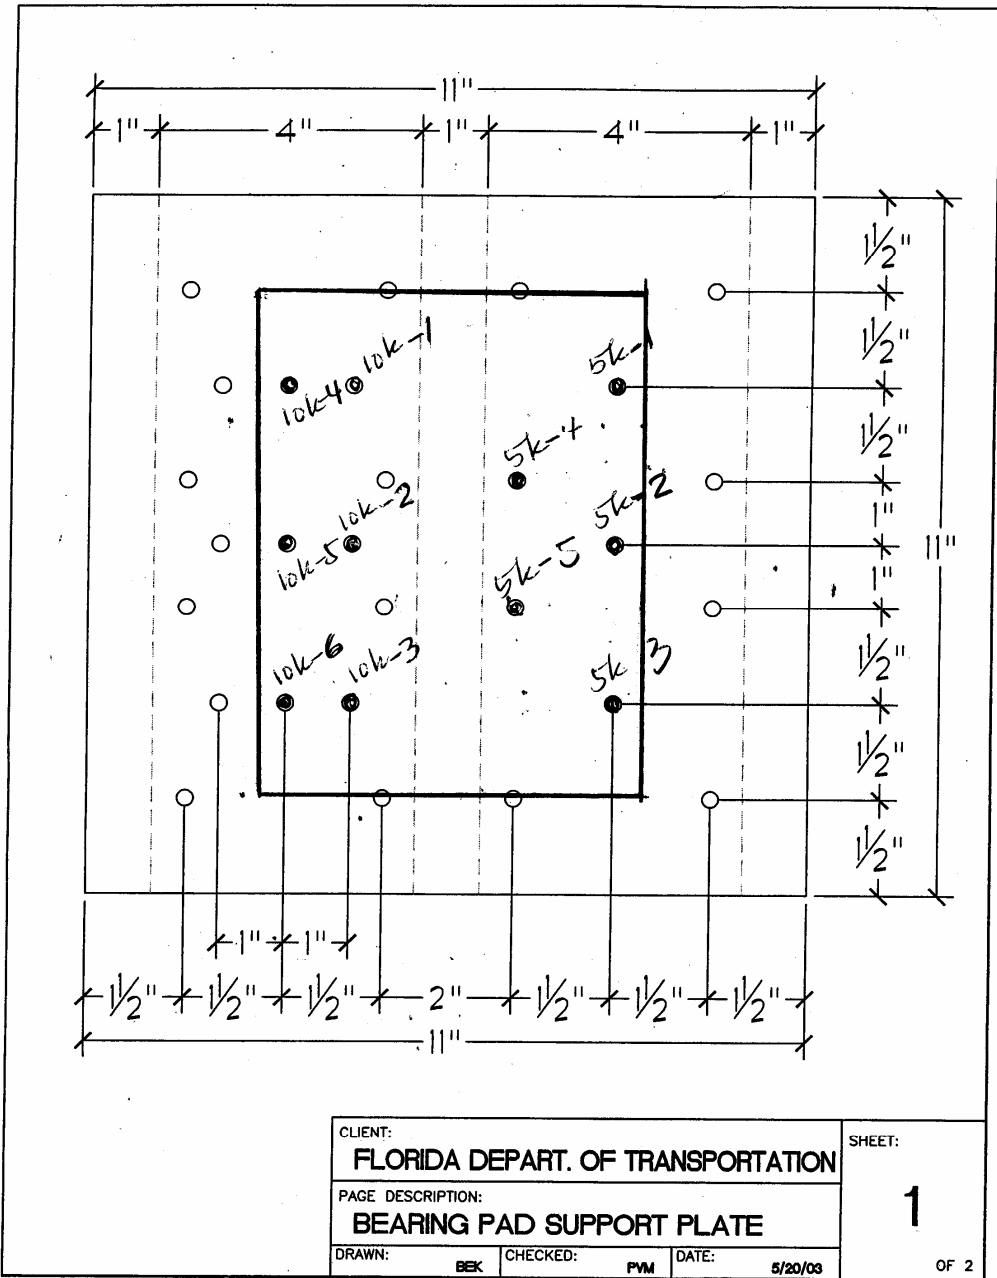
Pressure Gage Set-up for a 6x8 Bearing Pad
